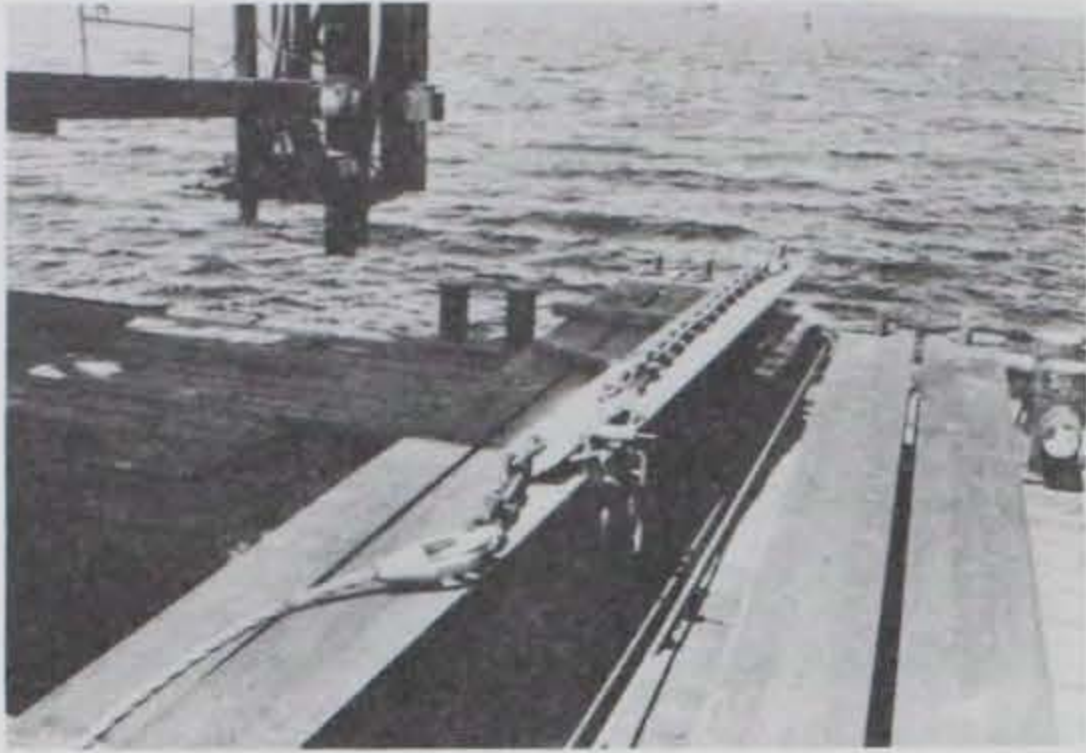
Photo showing H-pile with chain and steel rope attached (anchor force cell in chain).
